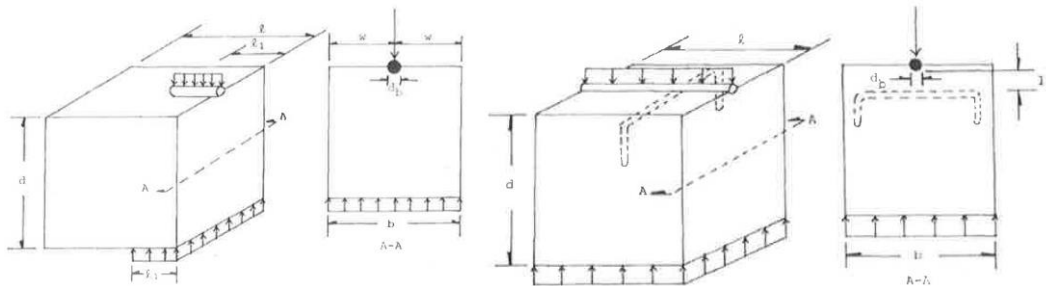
Tests on concrete foundation modulus, Sourashian [Sou1987]
